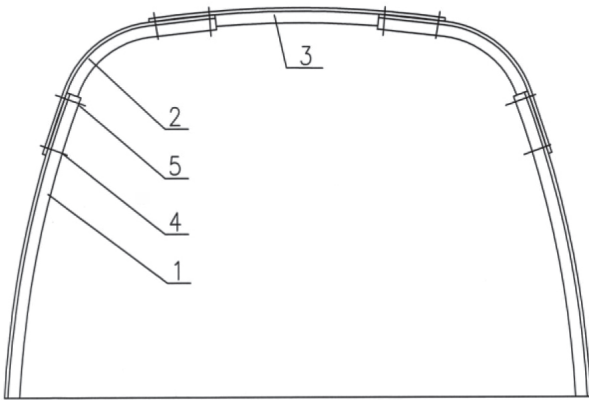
ŁPrP frame variant Ł: 1 – side section I, 2 – side section II, 3 – top section, 4, 5 – shackles
